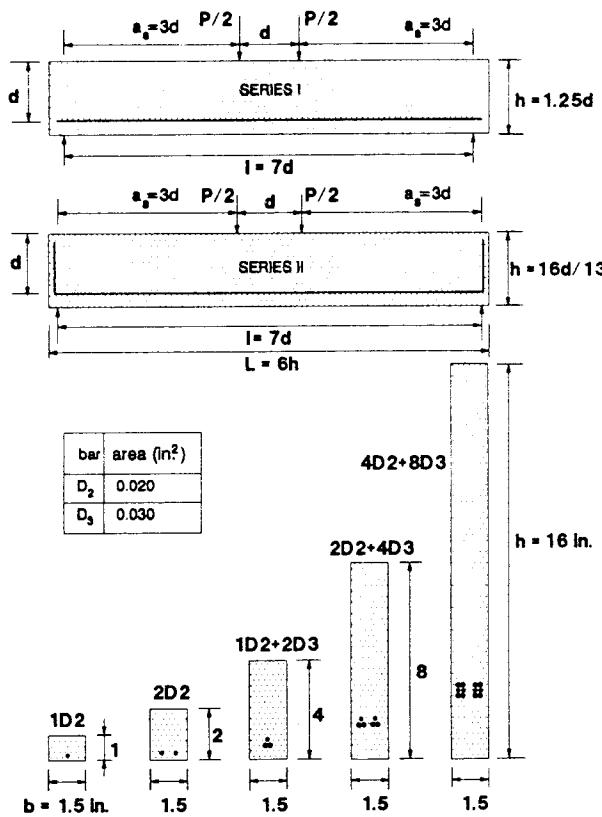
Test-specimen geometry (1 in. = 25.4 mm)
